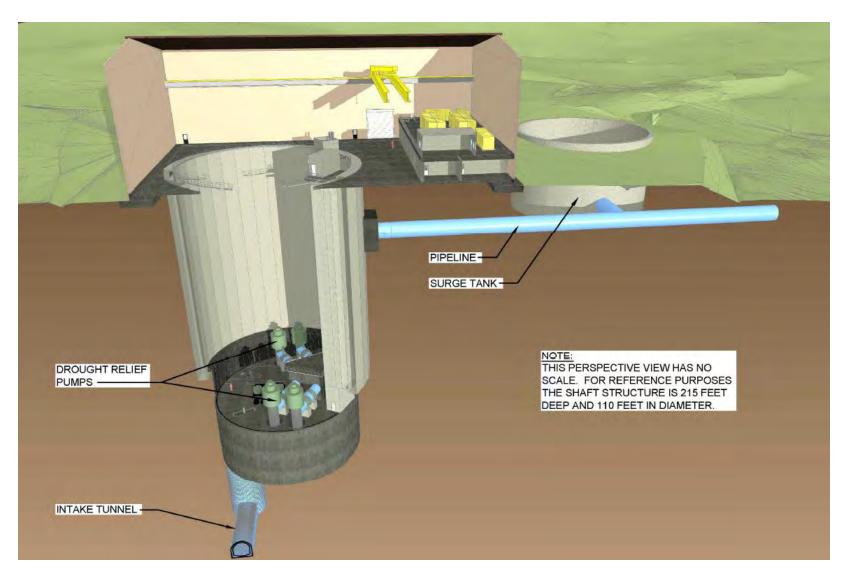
Three-dimensional Cross Section View of East Shore Pumping Plant (looking east)
